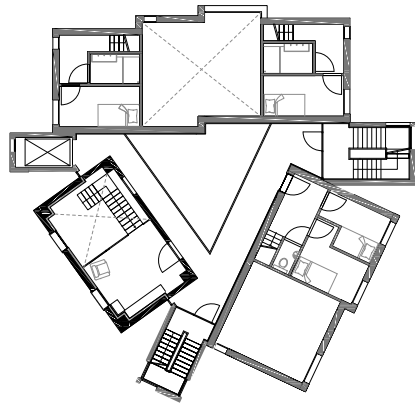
Fourth floor, scaled to fit - work/study, type C apartment, type B apartments
